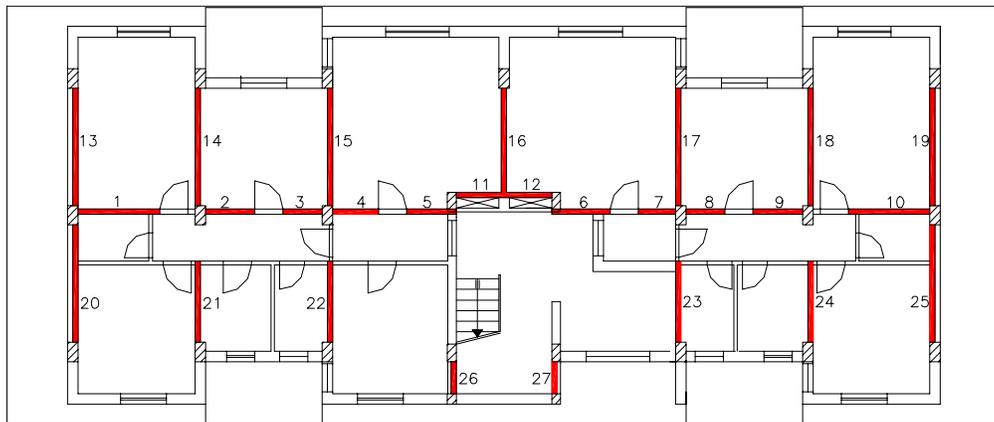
Typical floor plan with location of the thin reinforced concrete walls.
